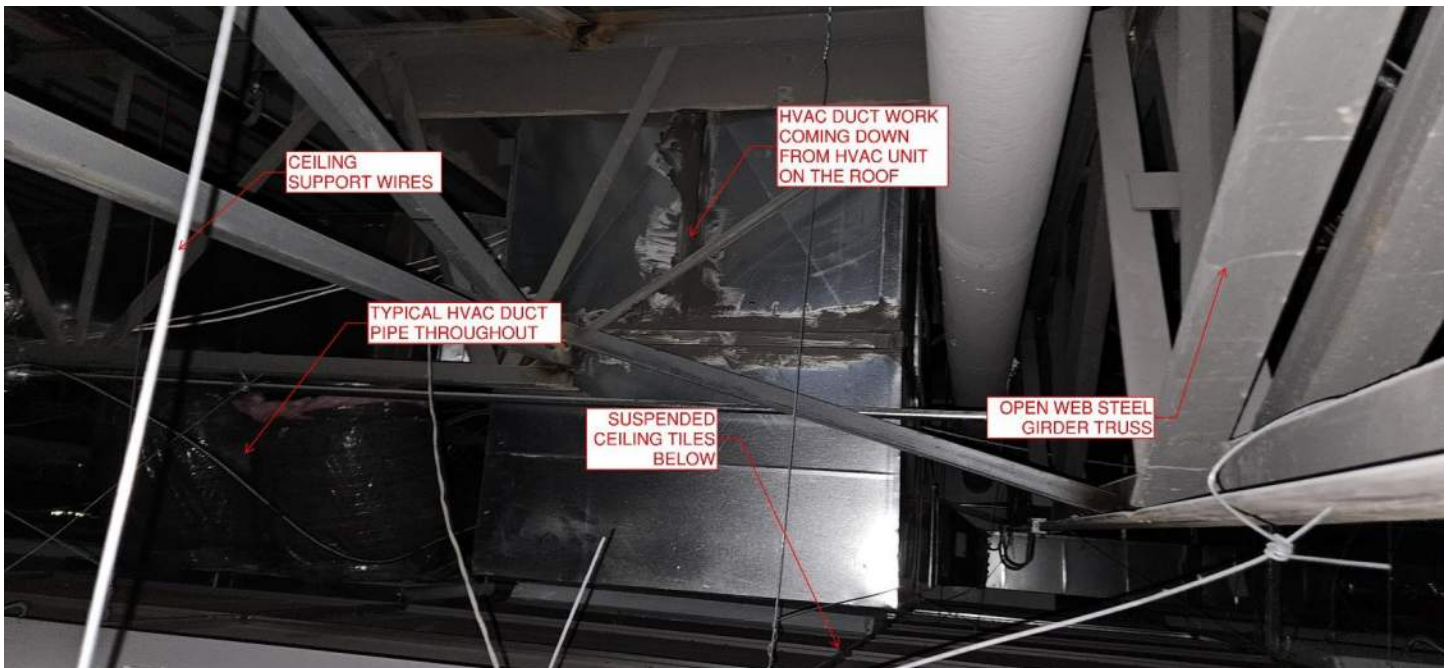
HVAC DUCTWORK BELOW MECHANICAL UNIT ABOVE
